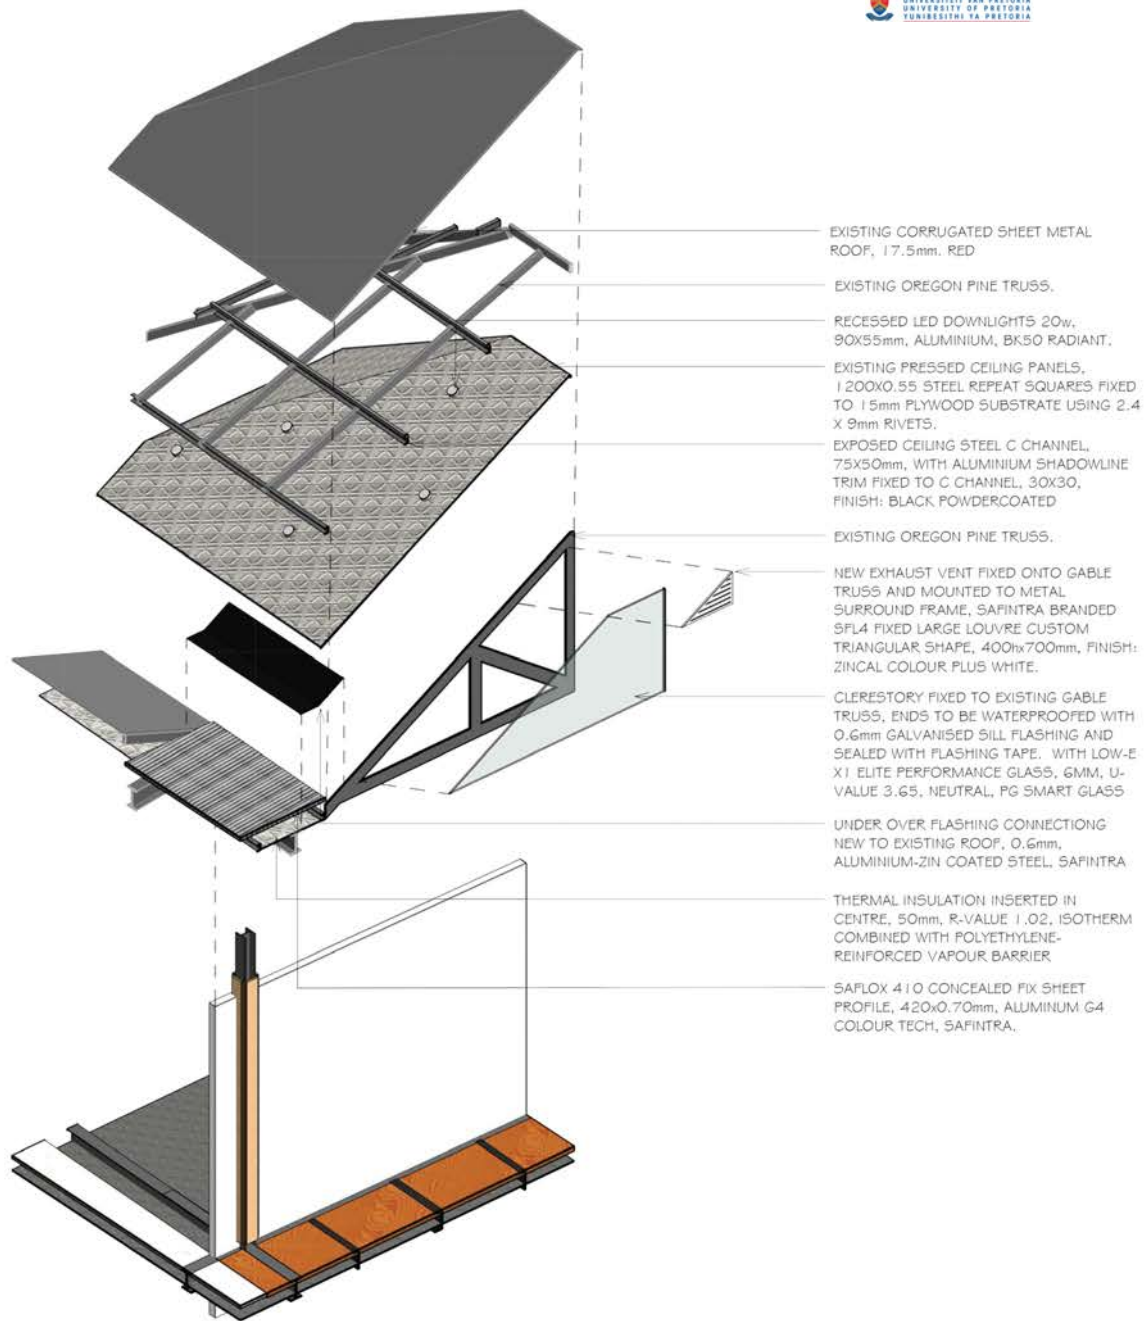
Roof and facade exploded axonometric, not to scale (Author 2018)
